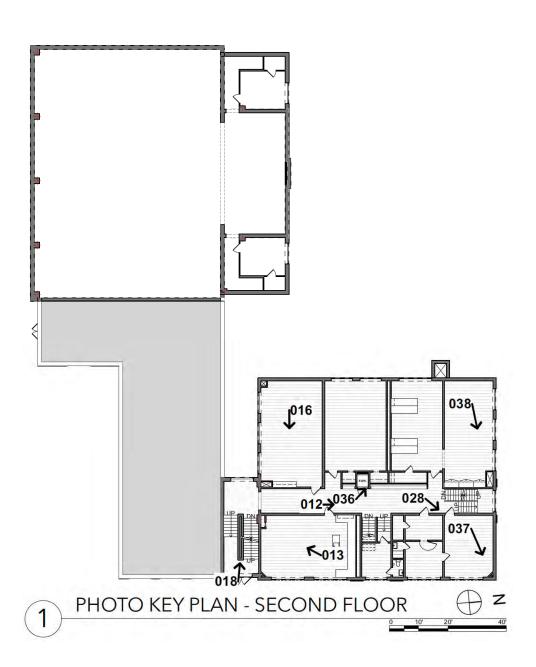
Photo key second floor plan. Drawn by Adam Davenport and Jake Decker.
